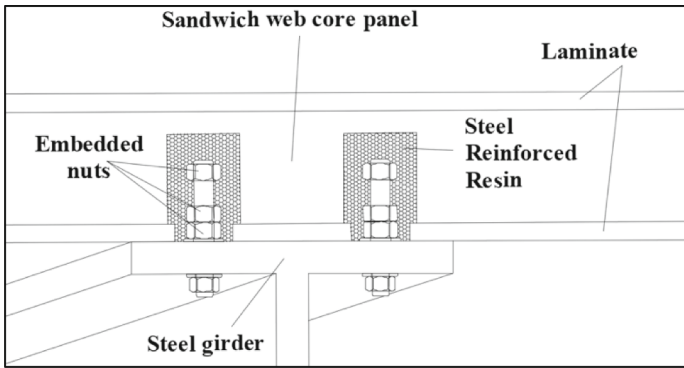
Close-up view of iSRR bolted connections between composite deck panel and steel girder
